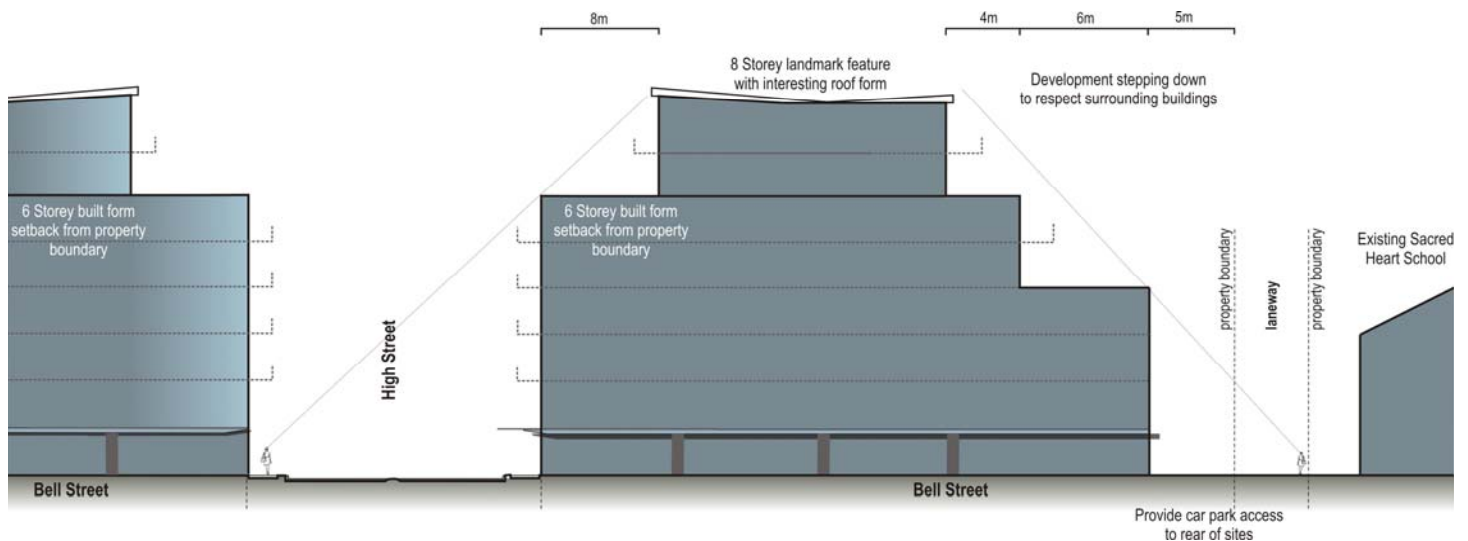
Indicative side and rear building setback to High Street and adjoining properties
